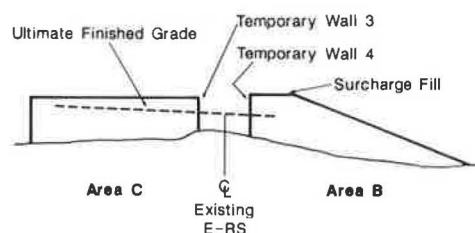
Typical cross section of the E-RS ramp with surcharge fill.
